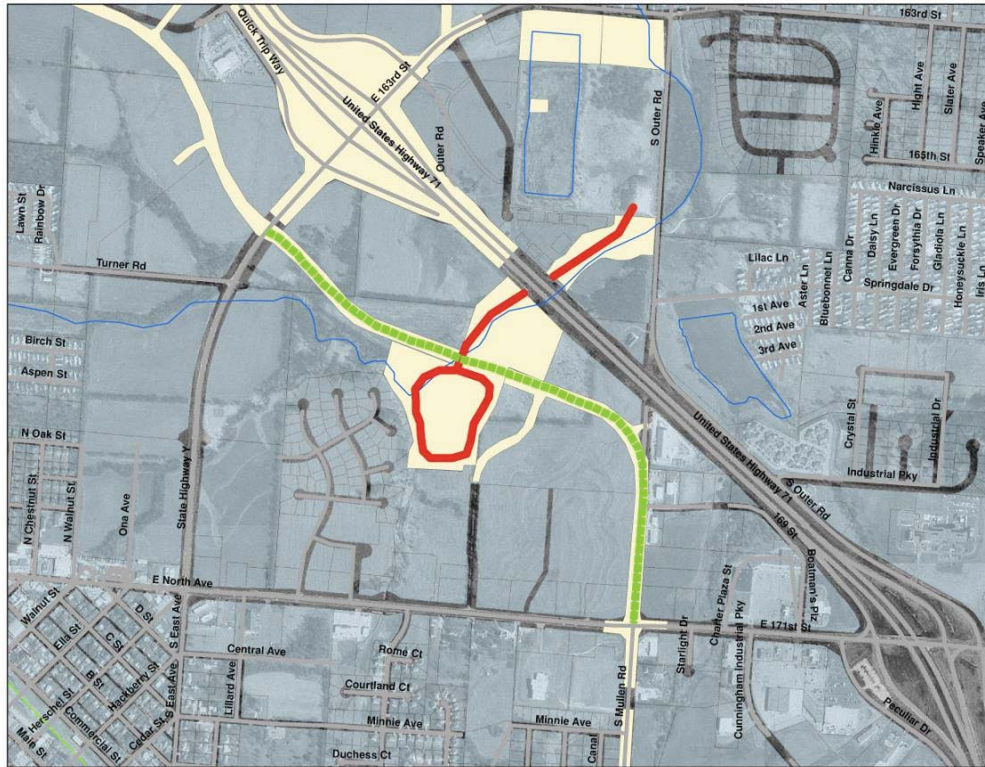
Markey Parkway, US71 Underpass and Wallace Extension
